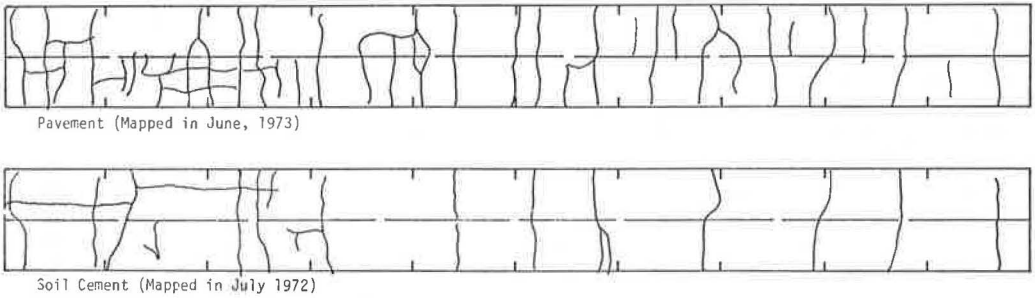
Cracking pattern of soil-cement base and superimposed pavement for experimental section with sugar additive.
